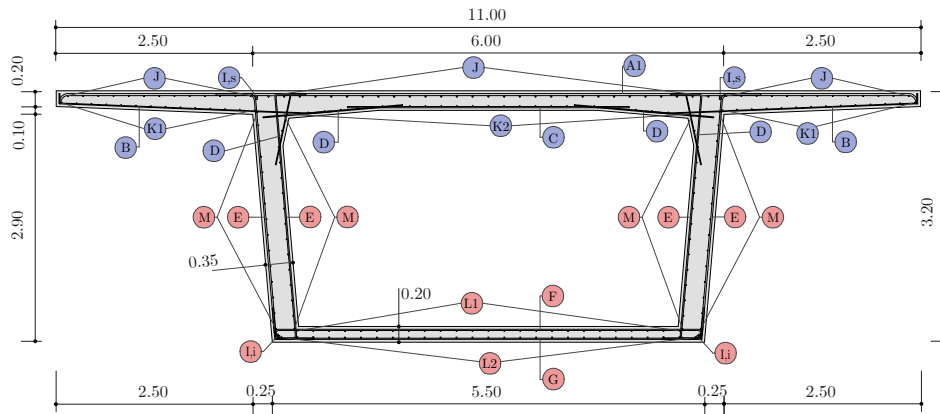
Cross-section of the Engaño Bridge in the C550 road.
